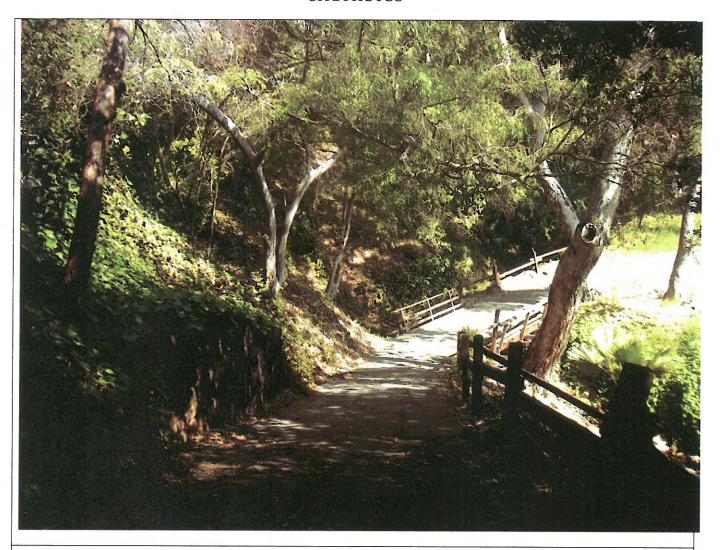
Viewing down the existing driveway toward the bridge over the creek (viewing generally east). Note the non-native acacia trees to left (north) and one western sycamore to right. Photo was taken from the gate at the top of the driveway.
